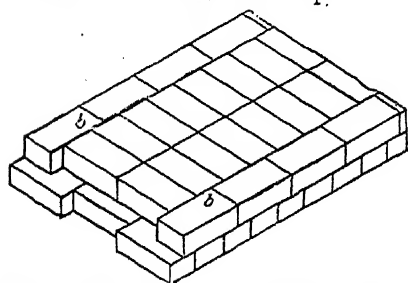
The joints across a wall should not break joint, as at *b, b*.
